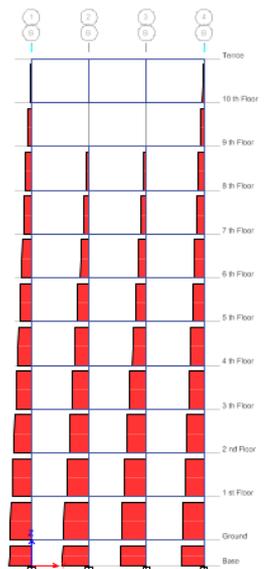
Transfer girder at 10<sup>th</sup> floor
